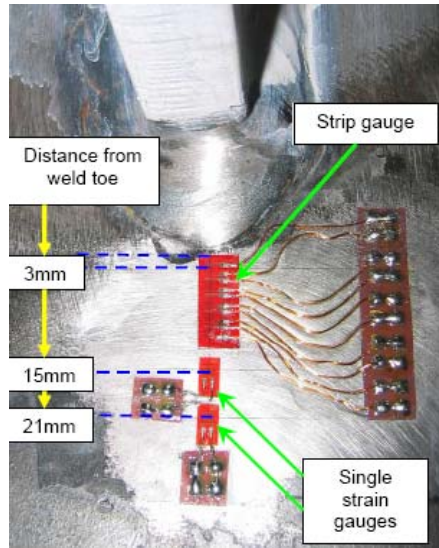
Instrumentation of welded panel: Typical strain gauge arrangement for full-scale panel
